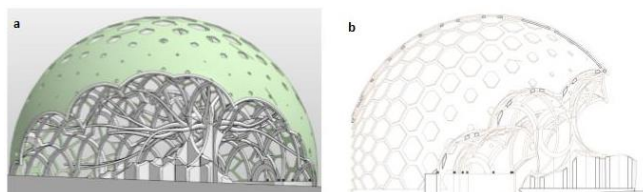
a. Final design of the Bioluminescent pavilion and b. Section Profile.
